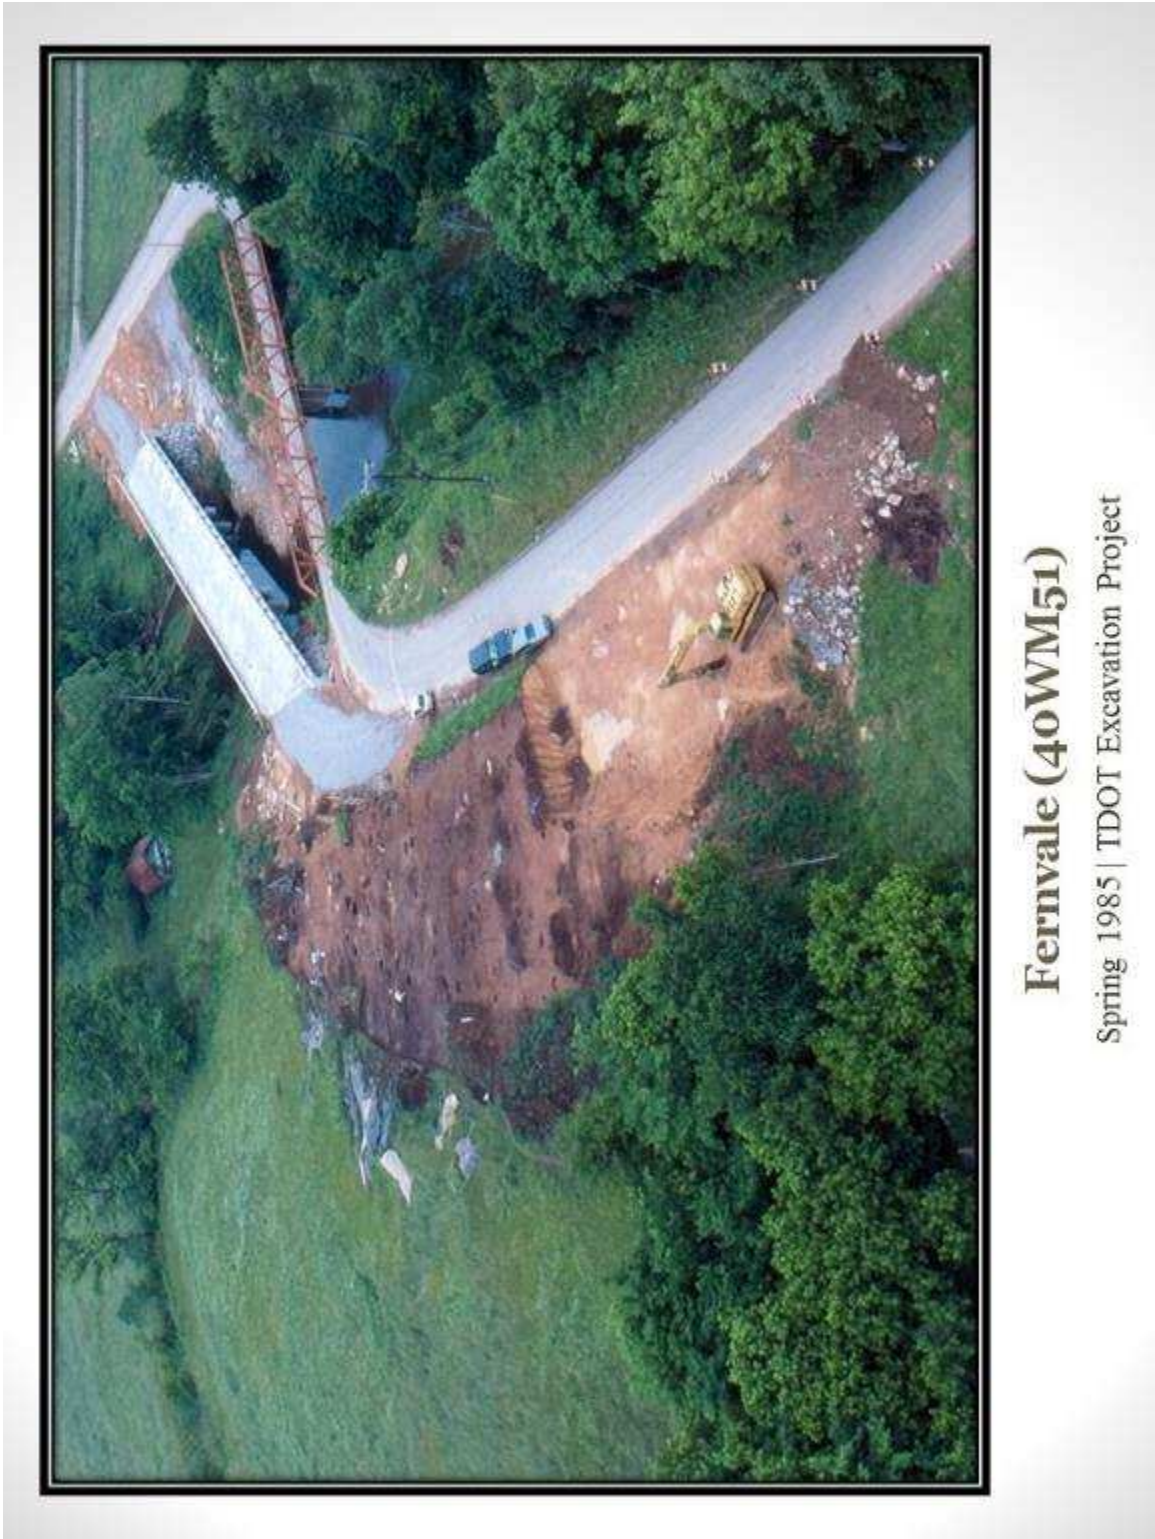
Bridge Construction | Spring 1985 | TDOT Excavation Project, 40WM51
